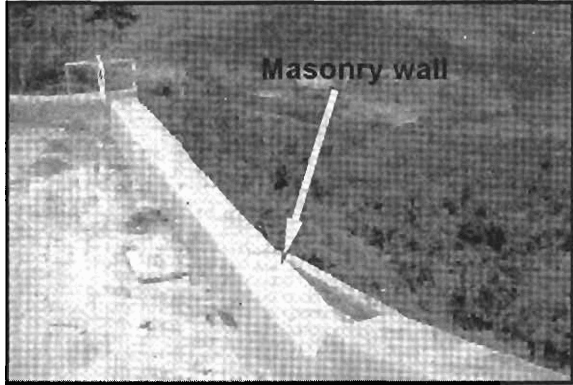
View of Tower 7 and the newly constructed masonry wall.
